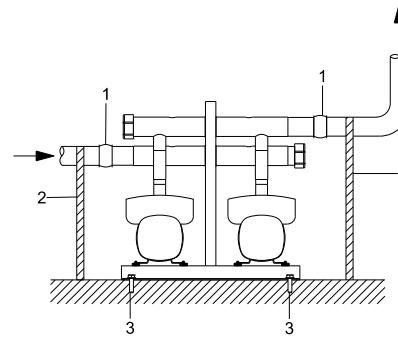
Example showing the position of expansion joints, pipe supports and mounting bolts
